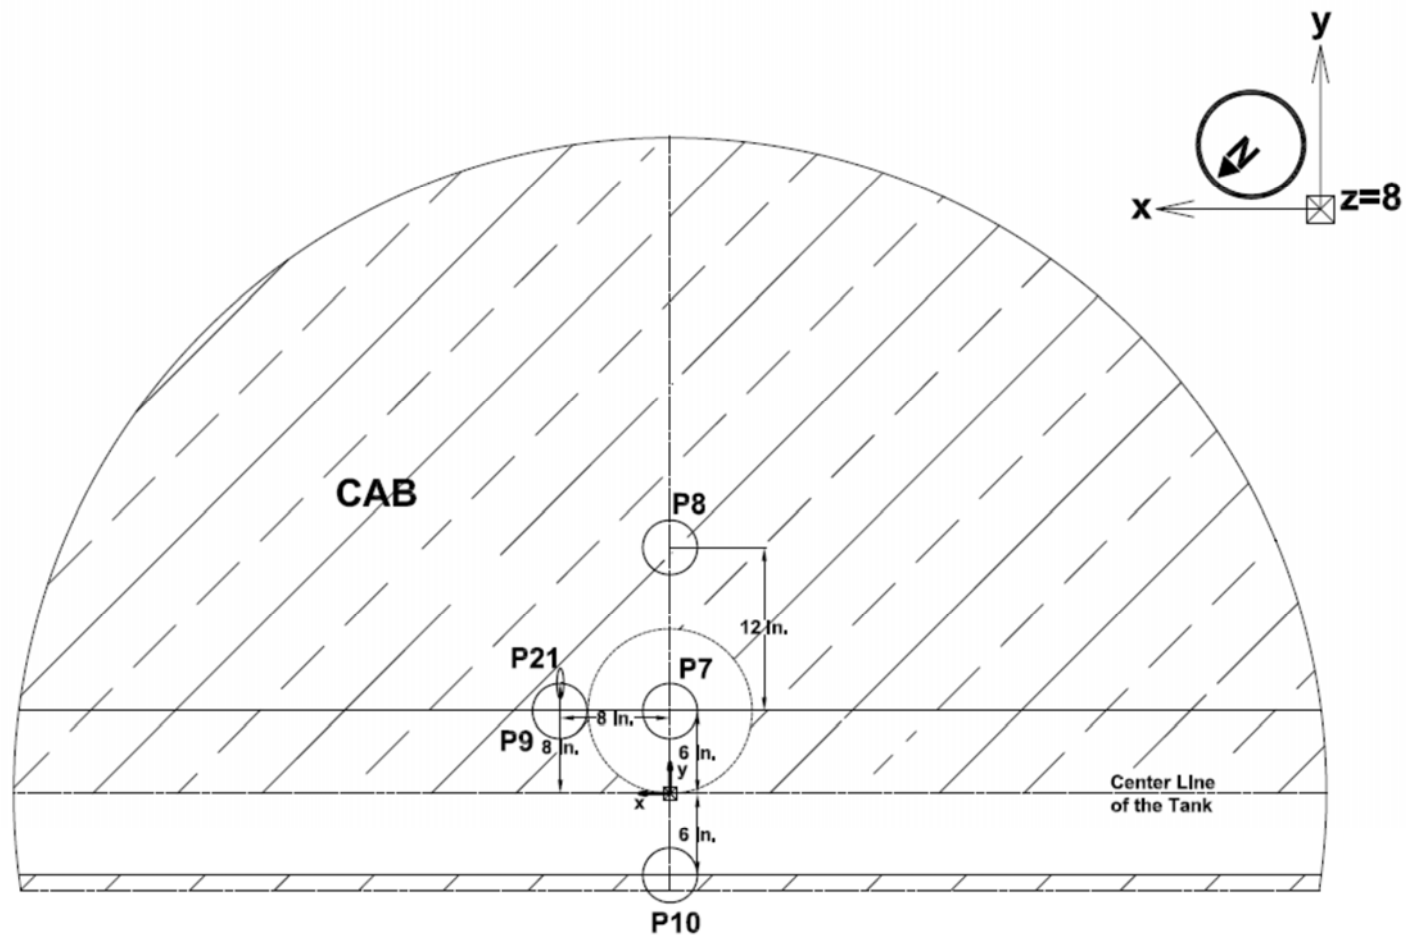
Instrumentation plan for experiment No. 10—Plan view, Z=8 inches
